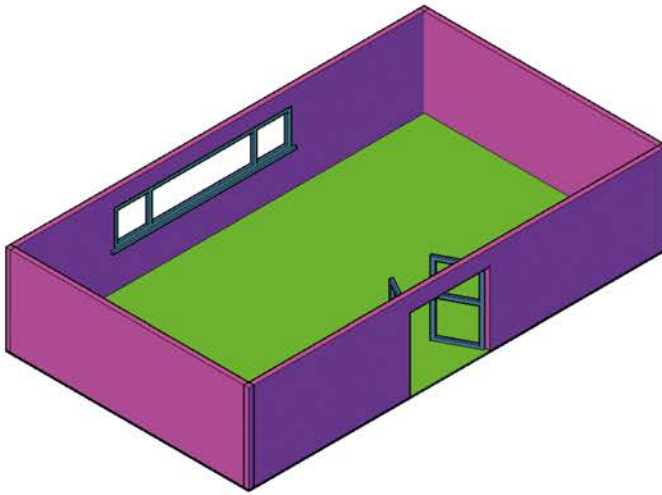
A conceptual style view of the walls, floor, doors and window
